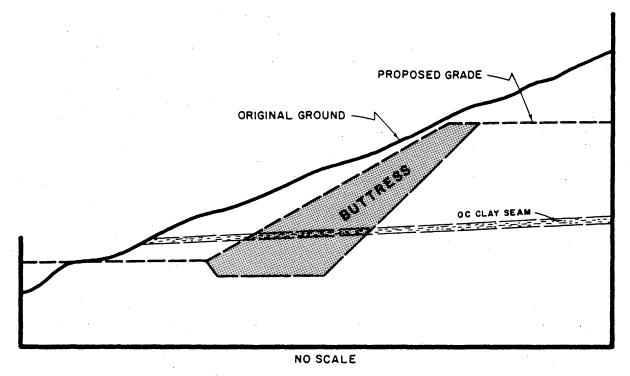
Typical cross section with buttress constructed to stabilize excavated slope.
